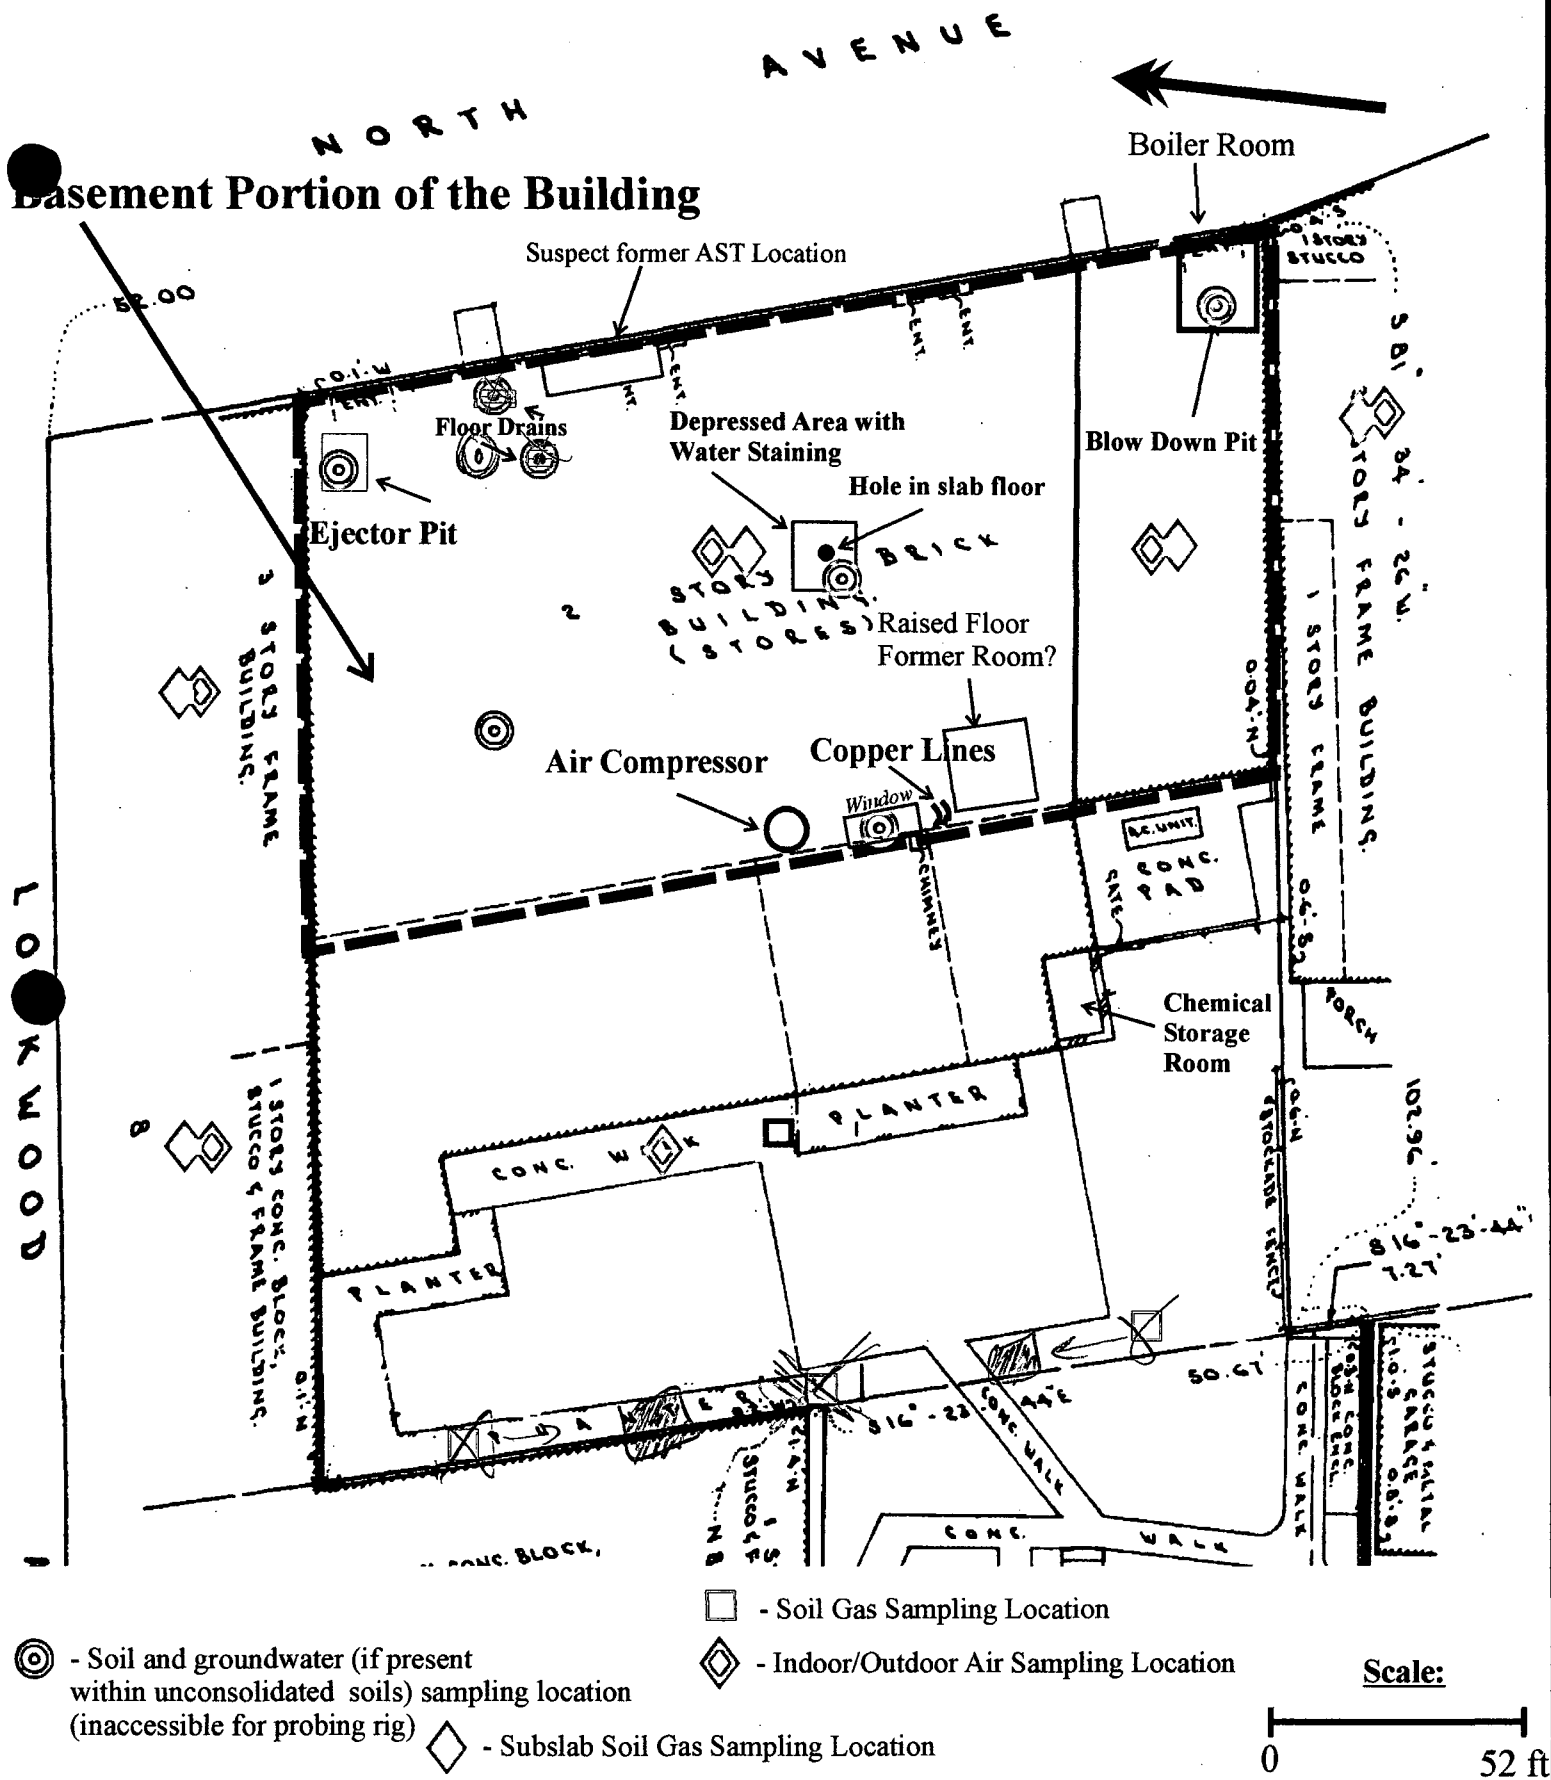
Proposed First Floor and Exterior Sampling Locations
